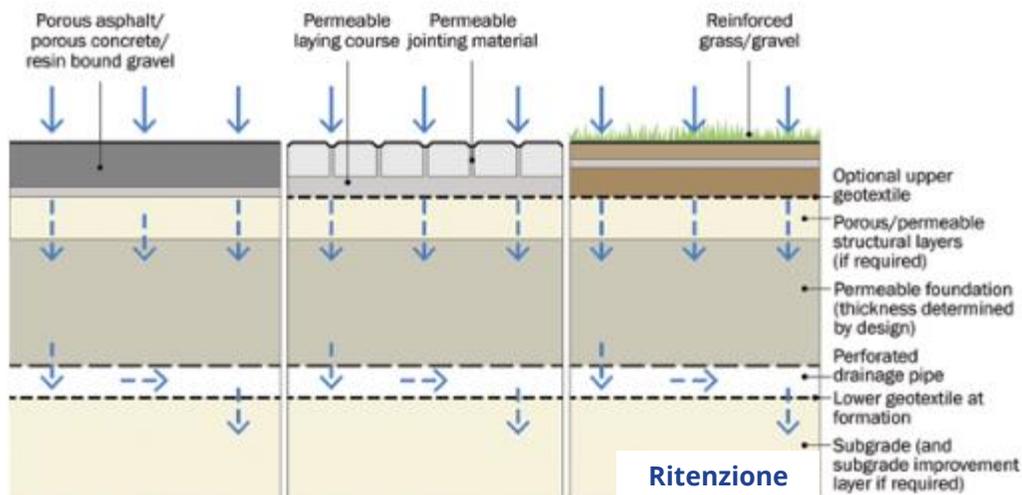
Pervious pavement system types: Type B – partial infiltration
